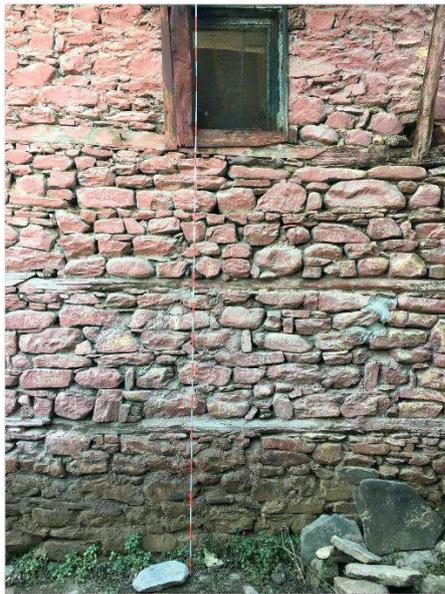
Rubble stone course in masonry wall – 2800-38
